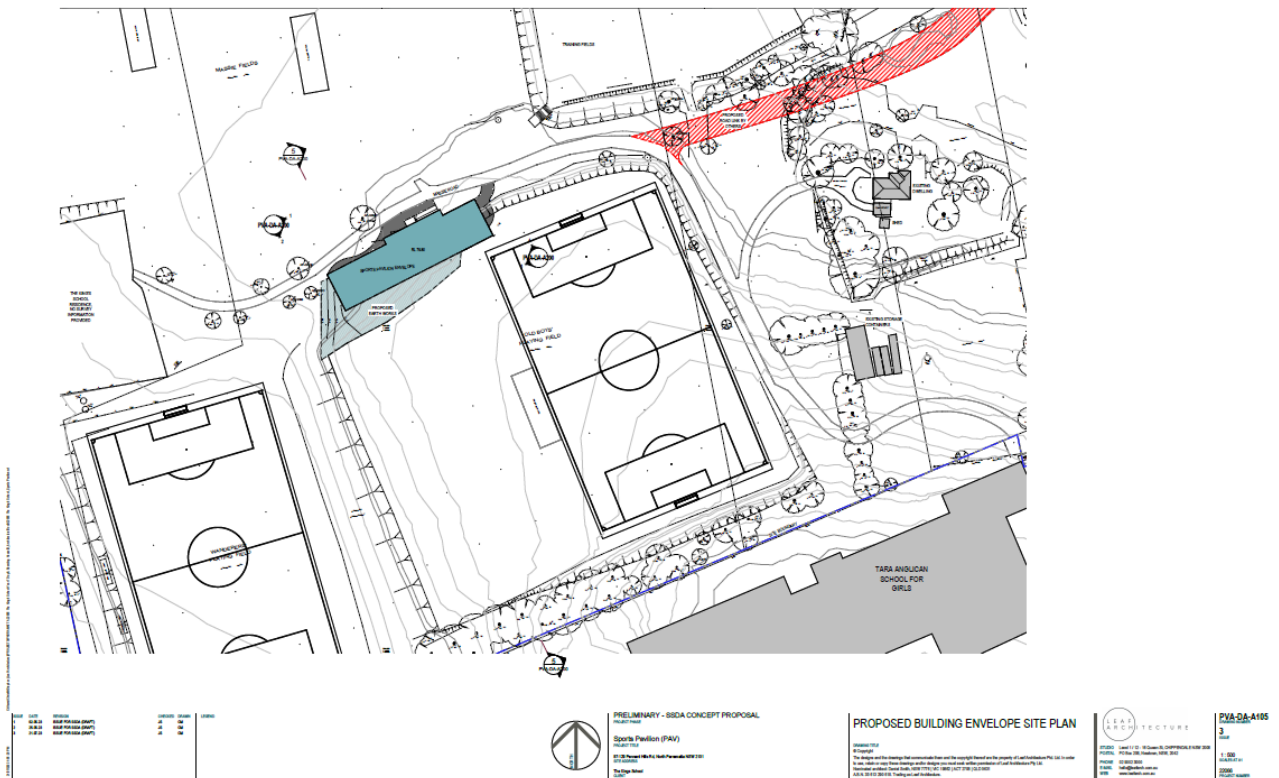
Proposed building envelope of the Sports Pavilion (concept and envelope only).
